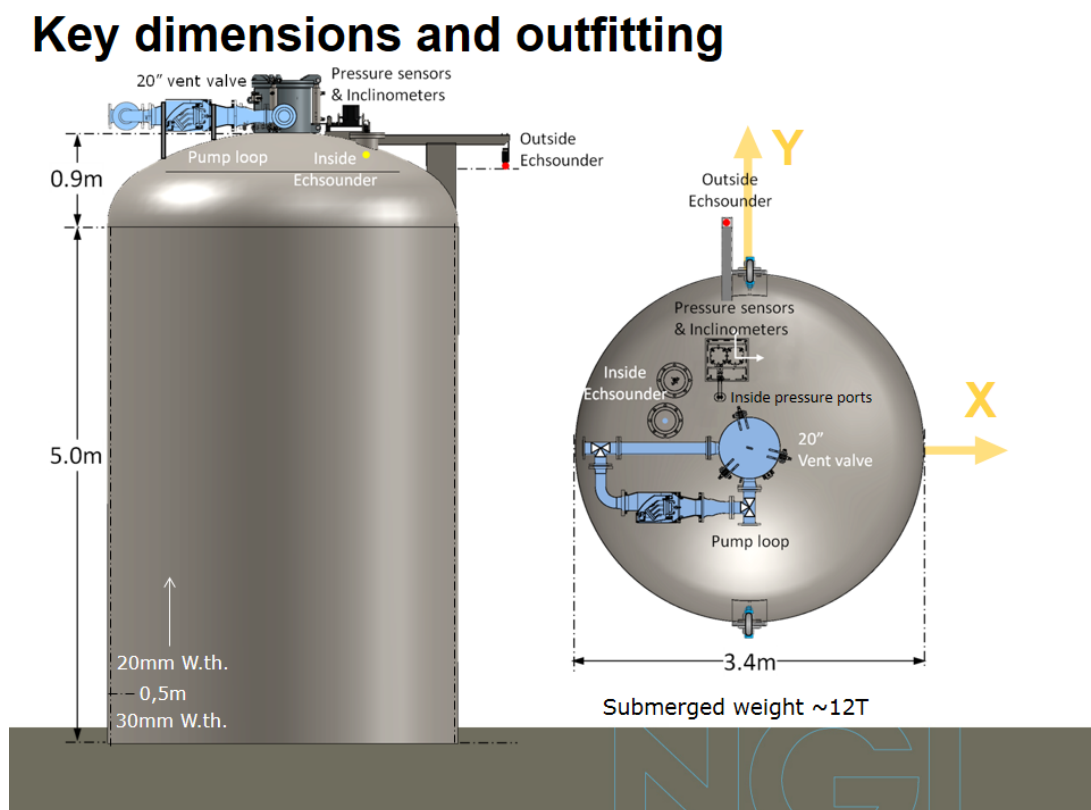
Suction anchor and equipment for pressure measurements from full-scale tests, courtesy of Sparrevik (2014)
